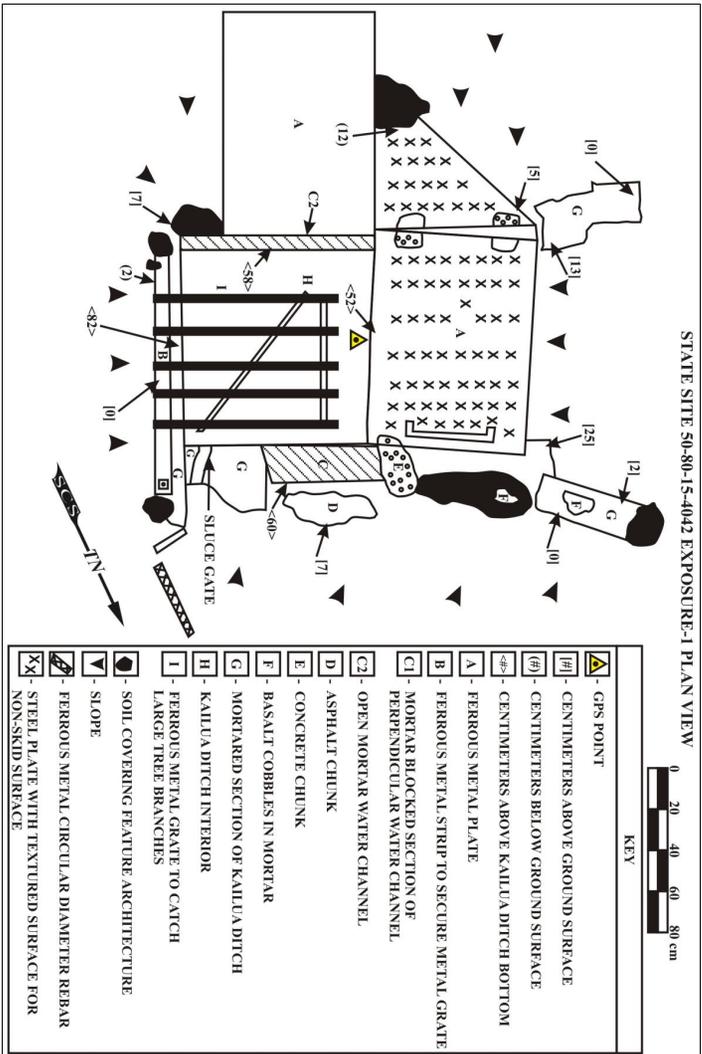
Plan View Drawing of State Site 50-80-15-4042, Exposure 1.
